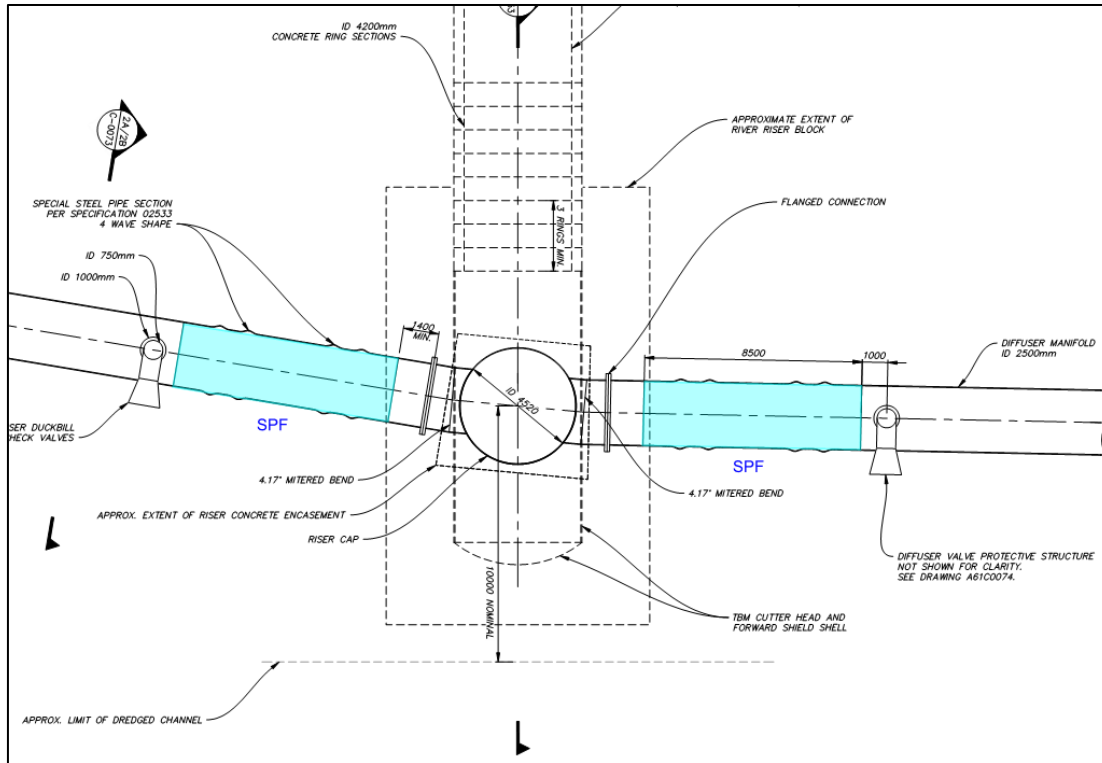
Diffuser Manifold SPF Sections (Drawing Number A61C0052)
